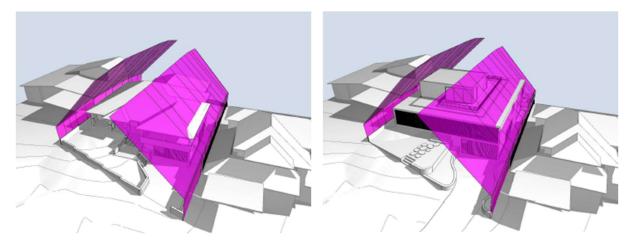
Building Envelope Plane with existing breach (left) and Building Envelope Plane with proposed breach (right) Source: Rama Architects
